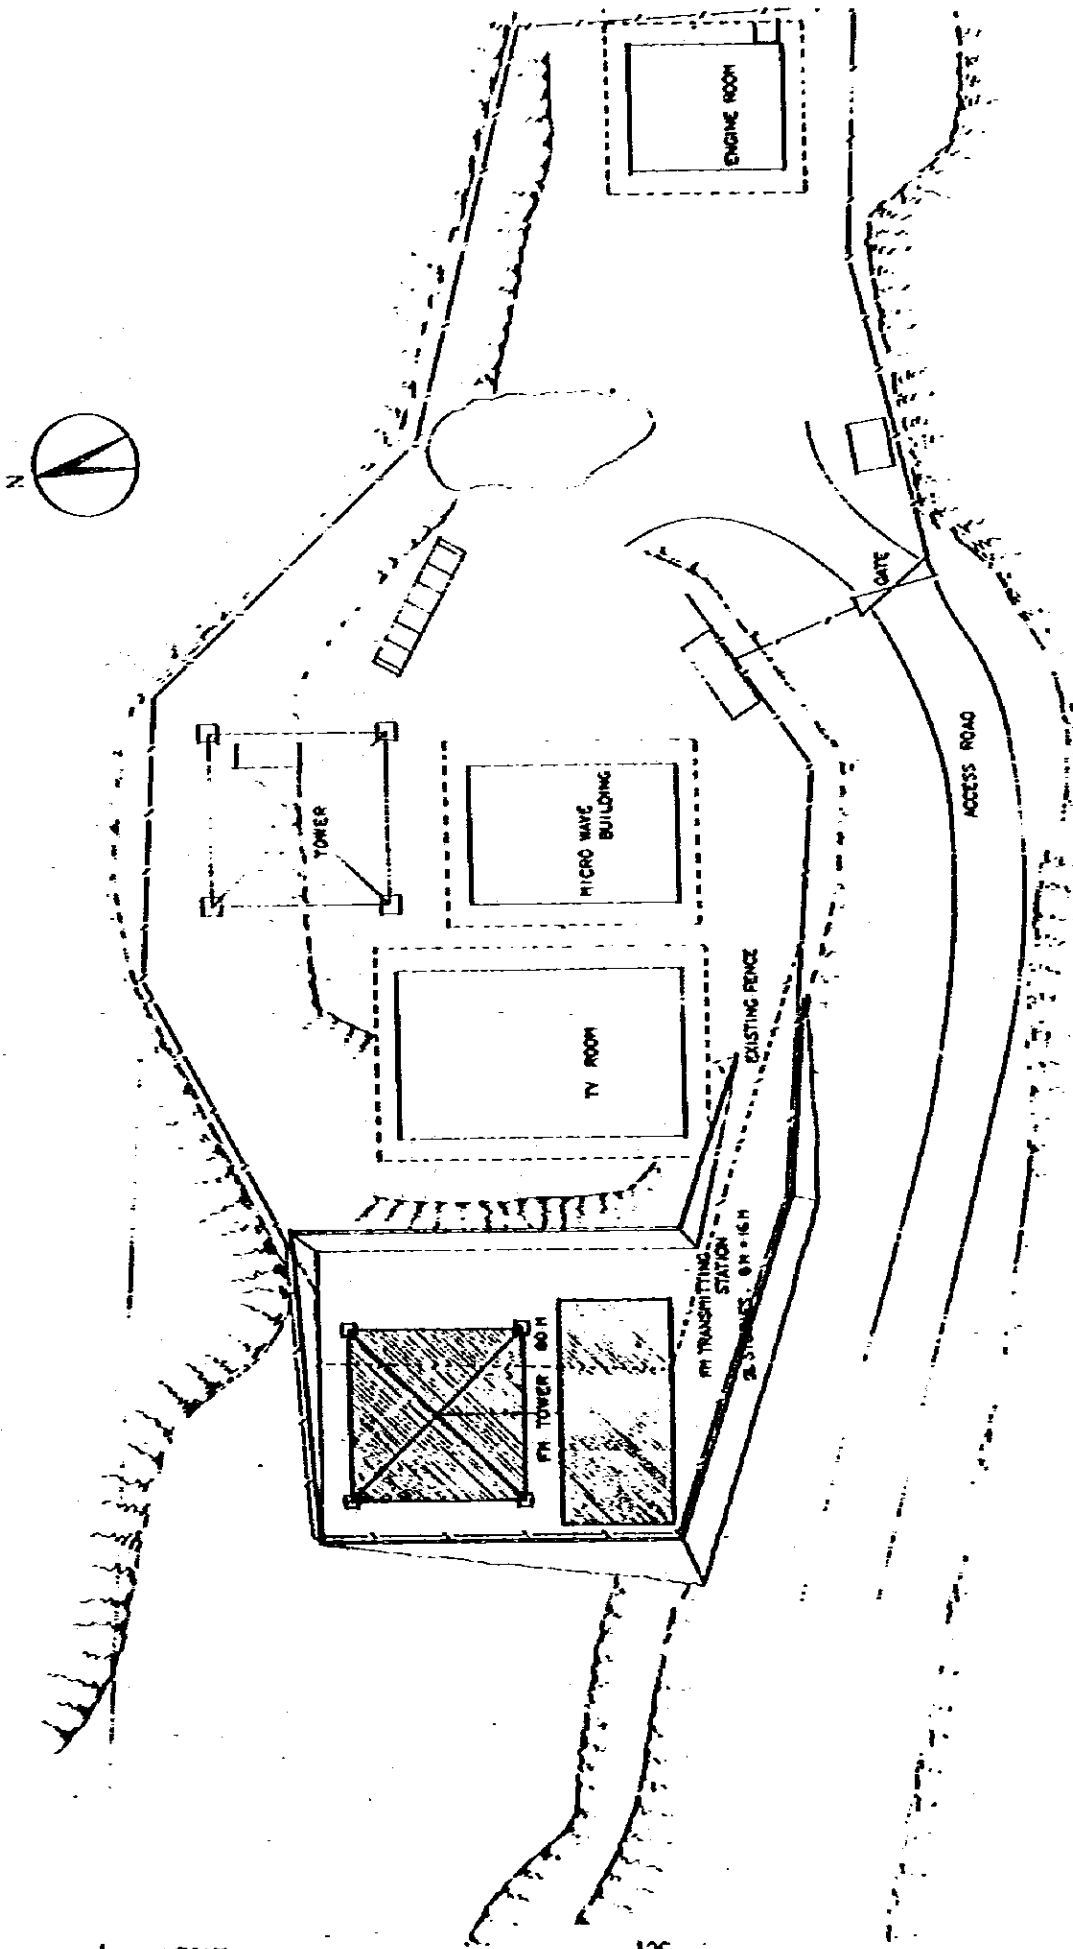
Site Plan -- Br. Tampin, Tampin
